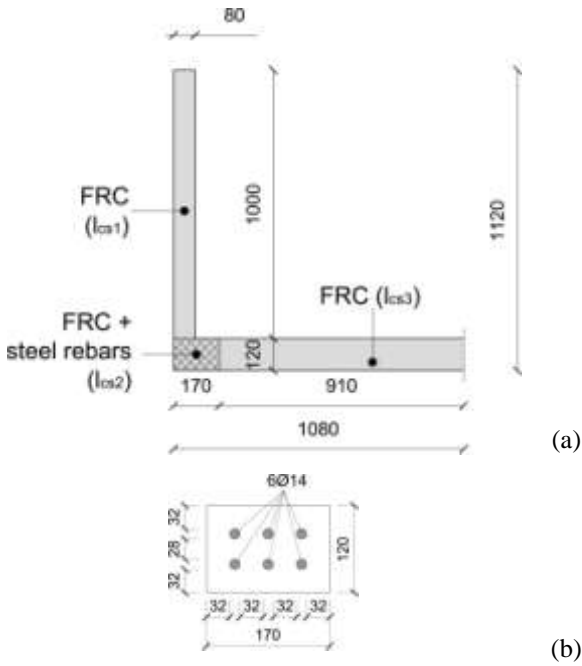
U-channel cross-section (measures in mm): half section (a) and detail of the part reinforced with steel bars (b).
